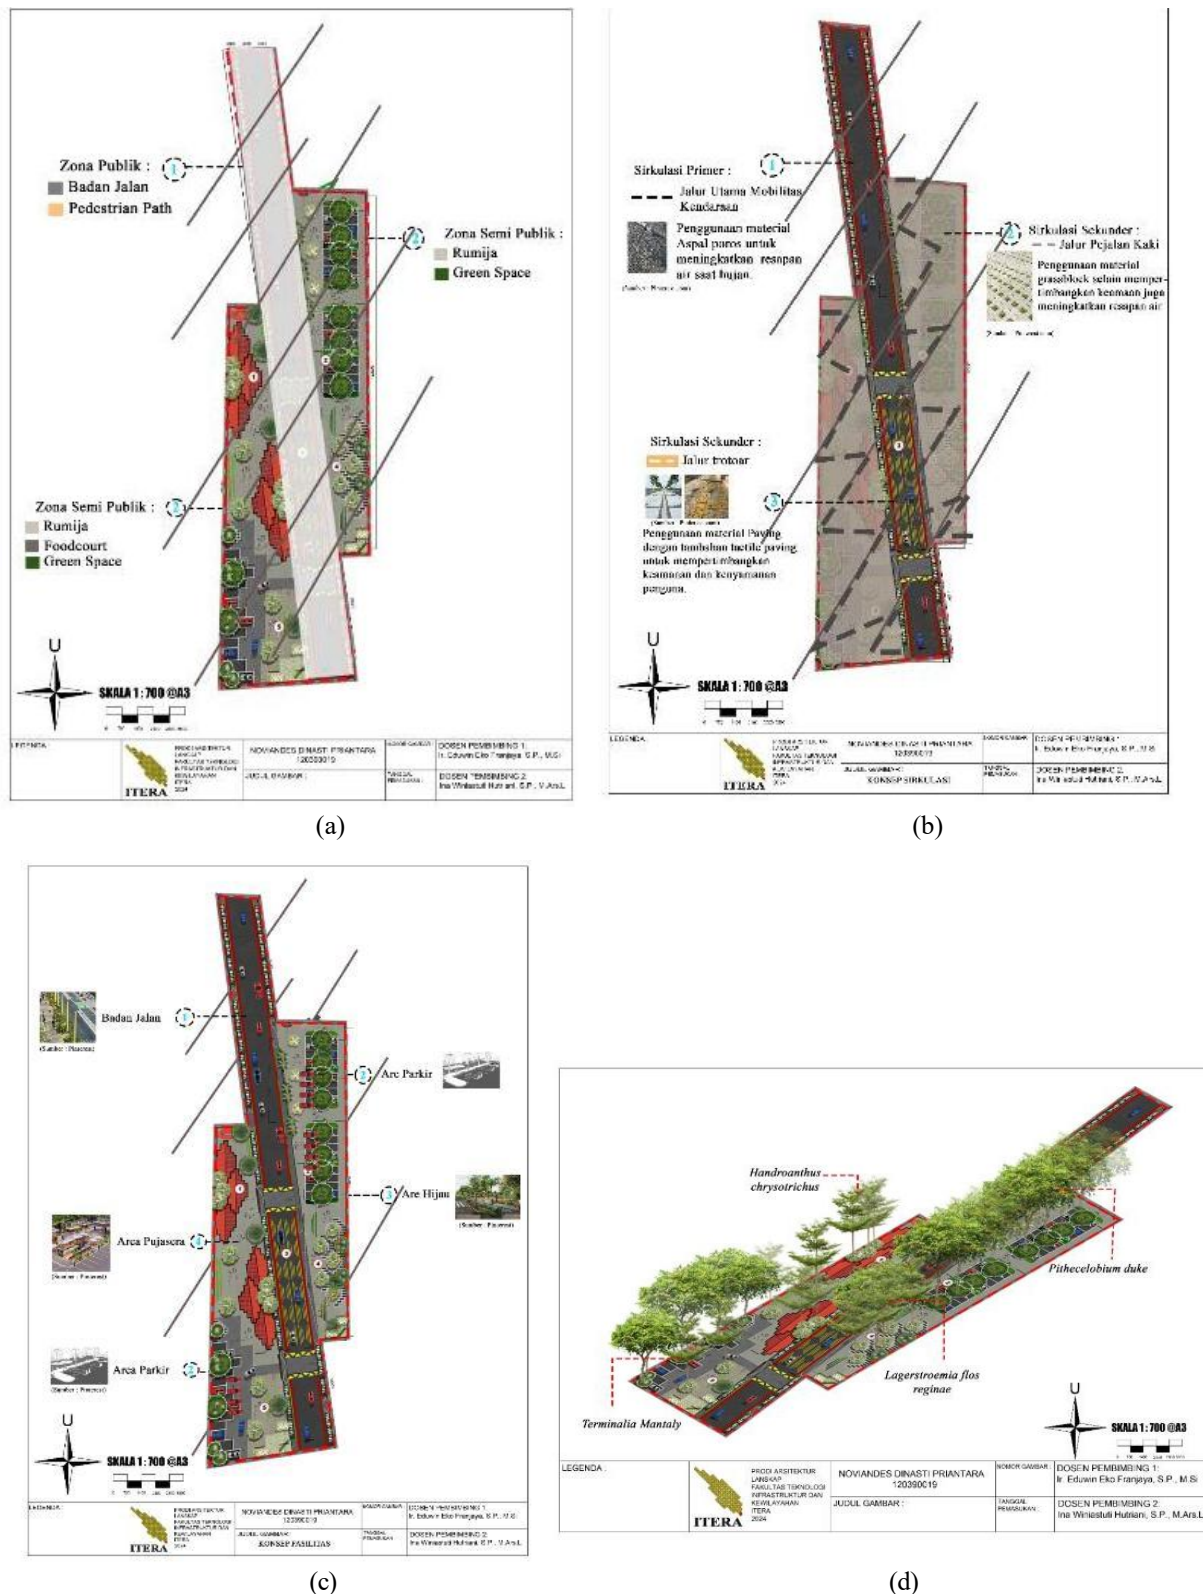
(a) Zoning Plan Concept, (b) Concept of Circulation Plan, (c) Facility Plan Concept, and (d) Concept of Vegetation Planning (source: author)
